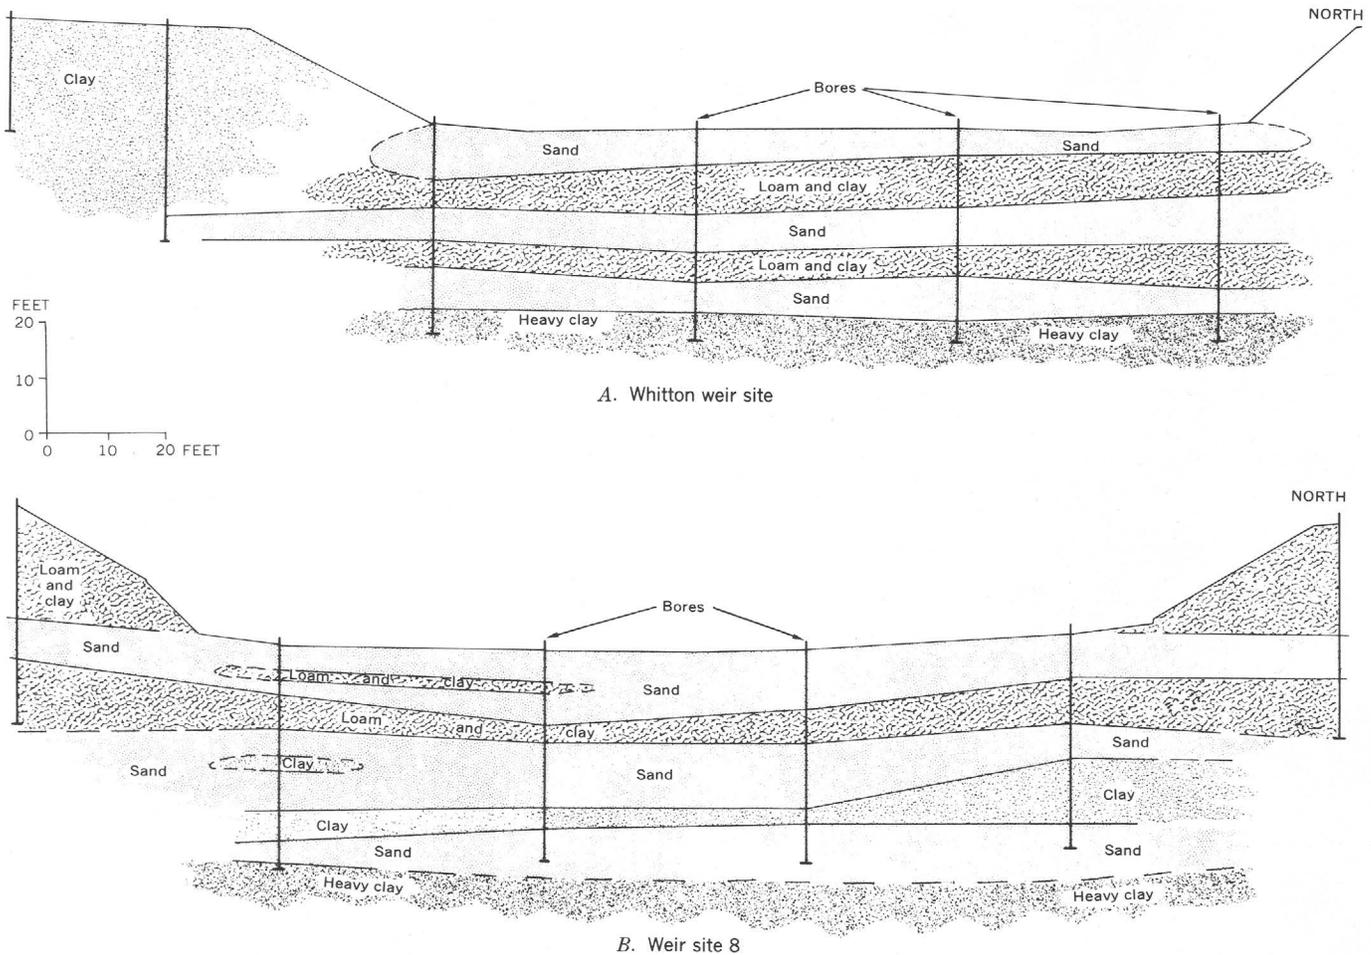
Channel of Murrumbidgee River and associated flood-plain sediments at the Whitton weir site and at weir site 8. (From New South Wales Water Conservation and Irrigation Comm. Plans cat. Nos. 145-101, 145-103.)
